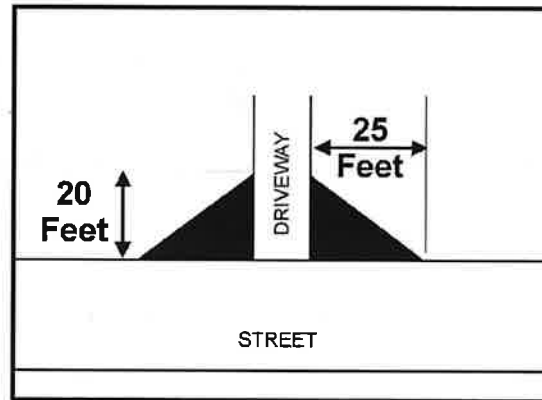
Traffic safety visibility triangle for driveway and street intersections.
